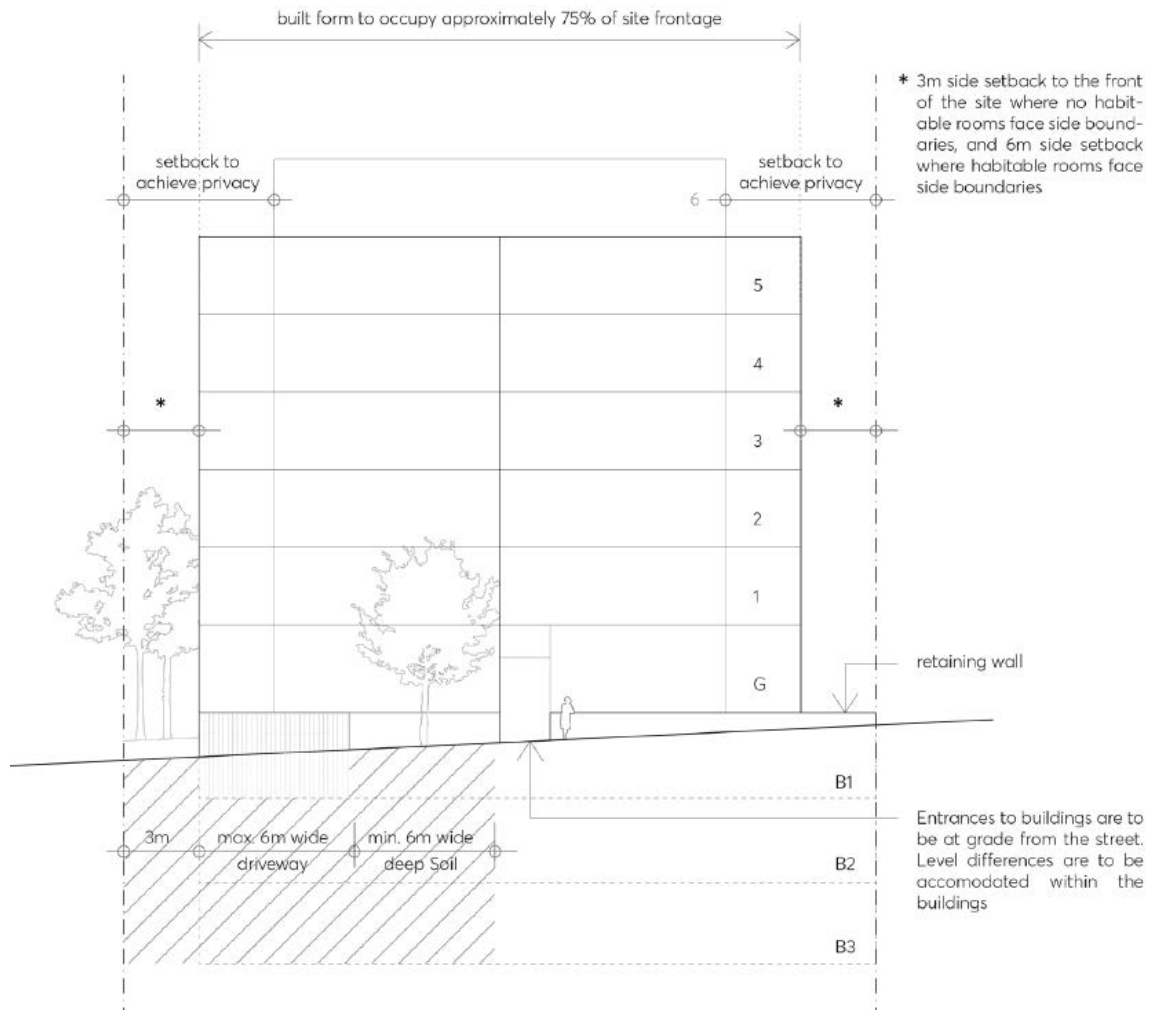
Indicative Street Frontage
